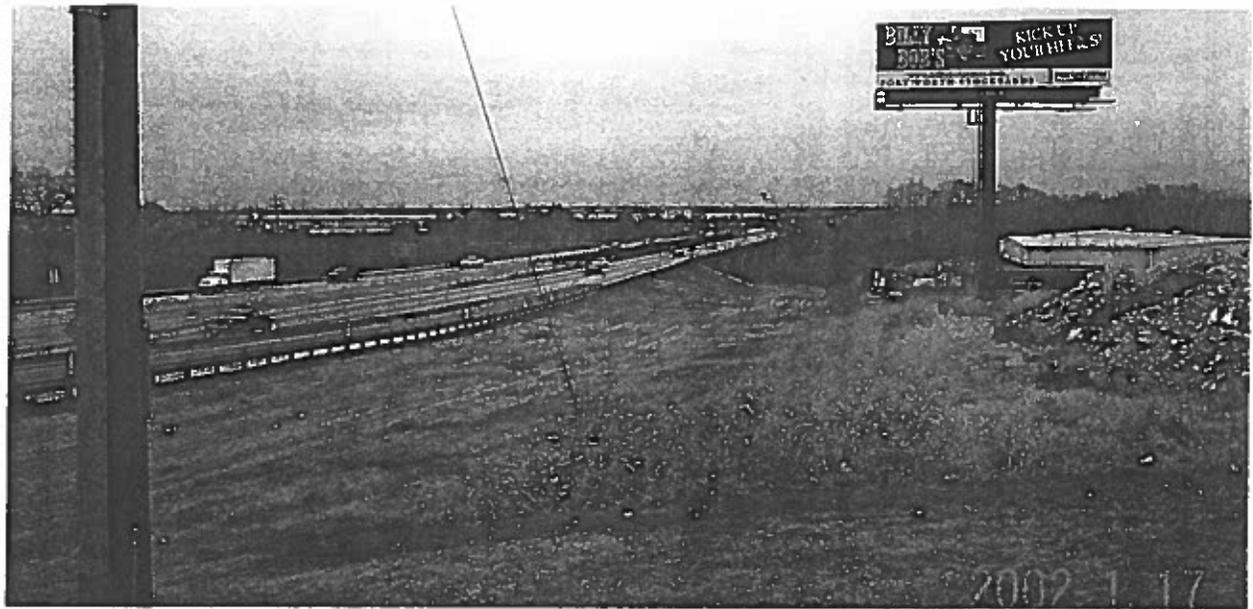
Looking north along east side of IH-820 from Randol Mill Road; approach to bridge on slight fill section. Right of way to edge of Trinity River exhibits considerable disturbance, with development to the east side. Some of the recent development on the floodplain of the Trinity River west of IH-820 is also visible, even if only barely.
